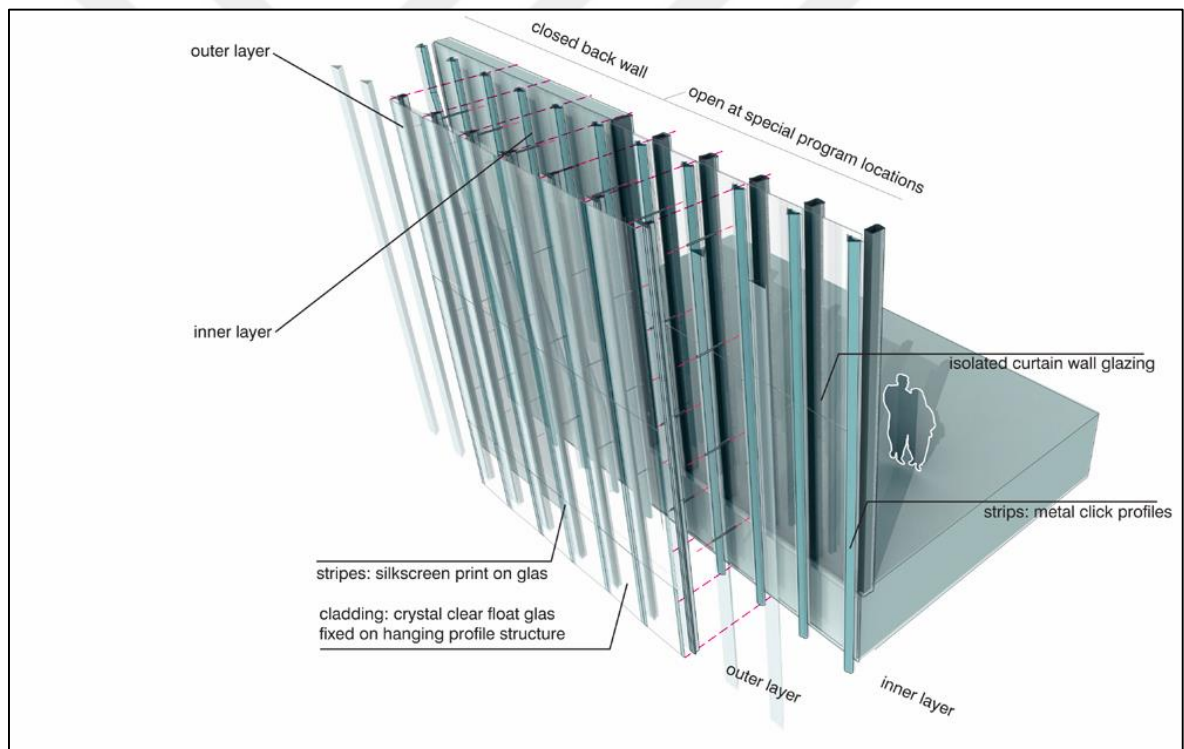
Galleria Centercity's Facade's double skin details [84]
